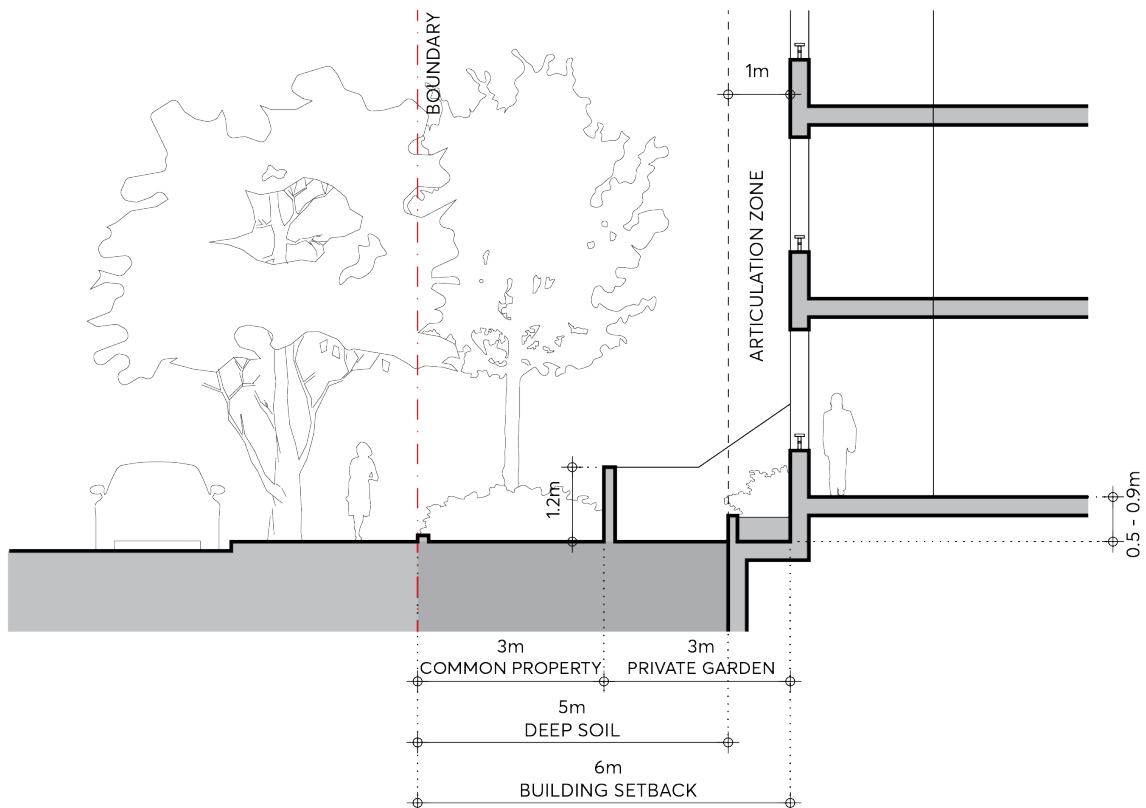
Residential Ground Floor Street Frontage
